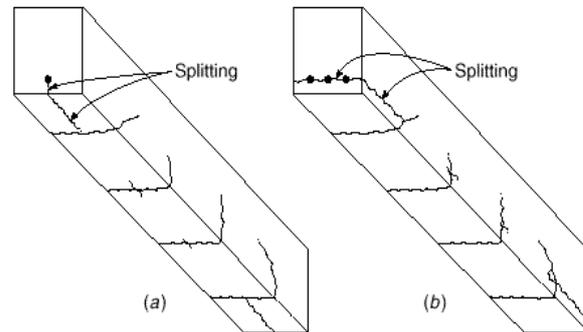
Splitting of Concrete along Reinforcement (Nilson)
